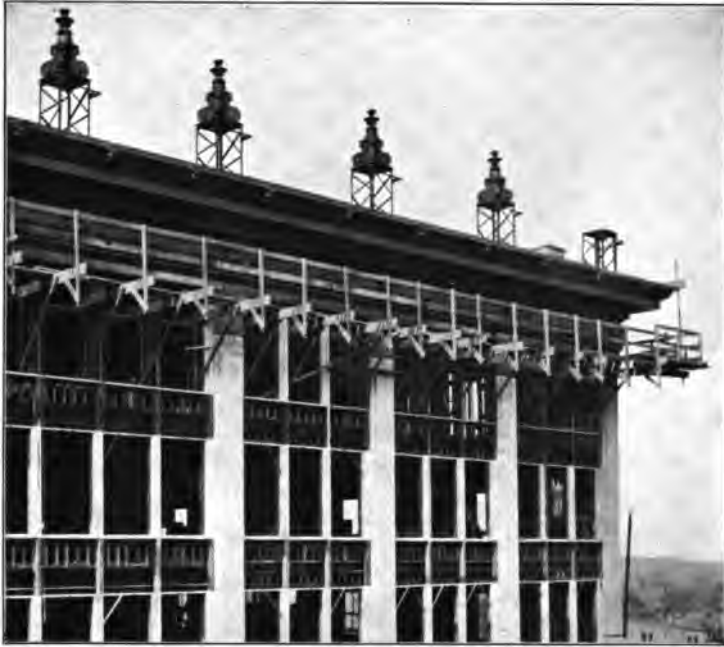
A WELL-CONSTRUCTED OUTRIGGER SCAFFOLD.
